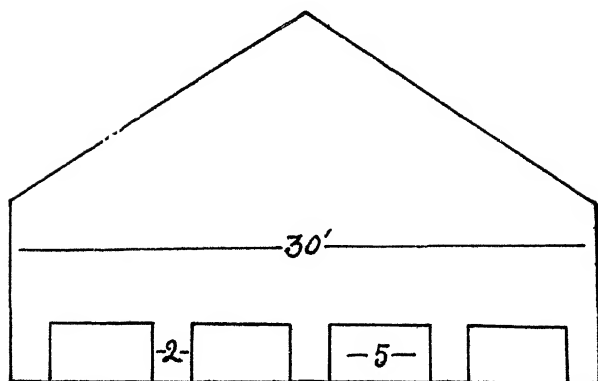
An arrangement of benches in a 30-foot house. Only $66\frac{2}{3}$ per cent of the floor space available for crops.
